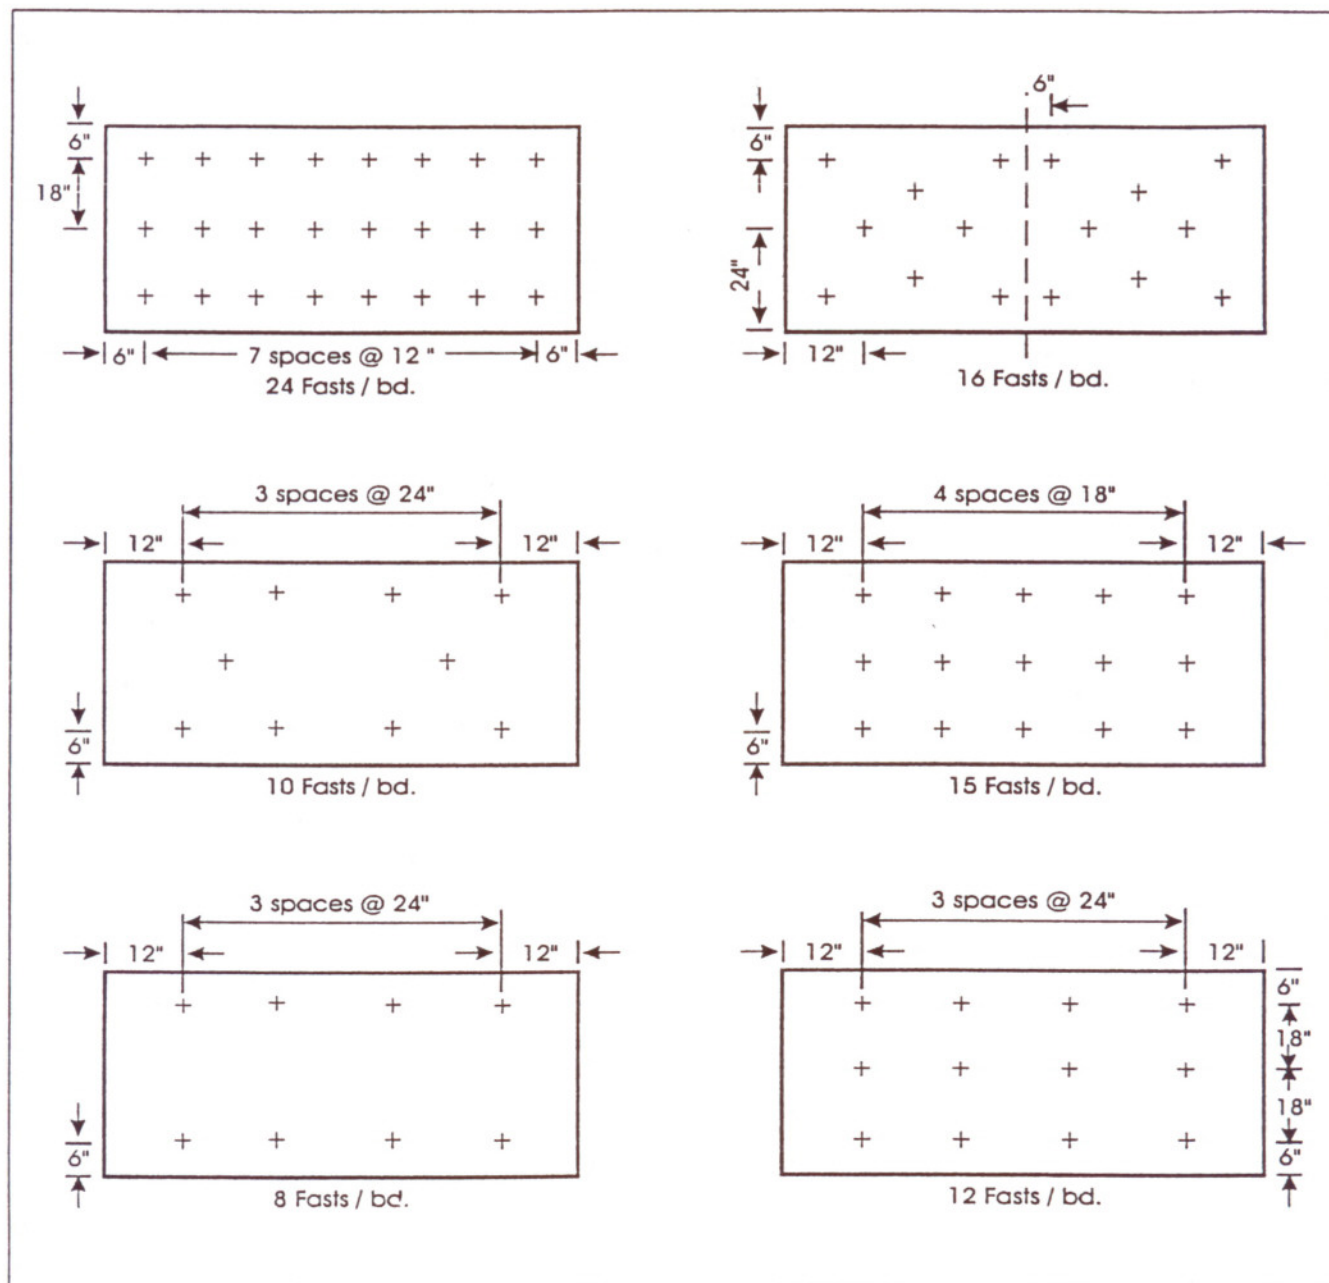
Fastener placement 4 x 8 ft (1.2 x 2.4 m) boards.
